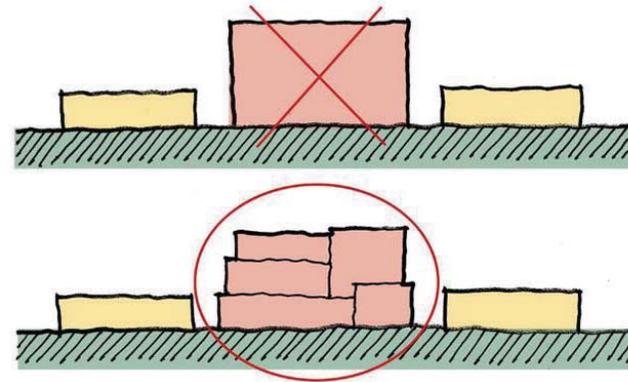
The mass of the larger building steps down near smaller buildings and the varied roof forms reduce apparent size.
